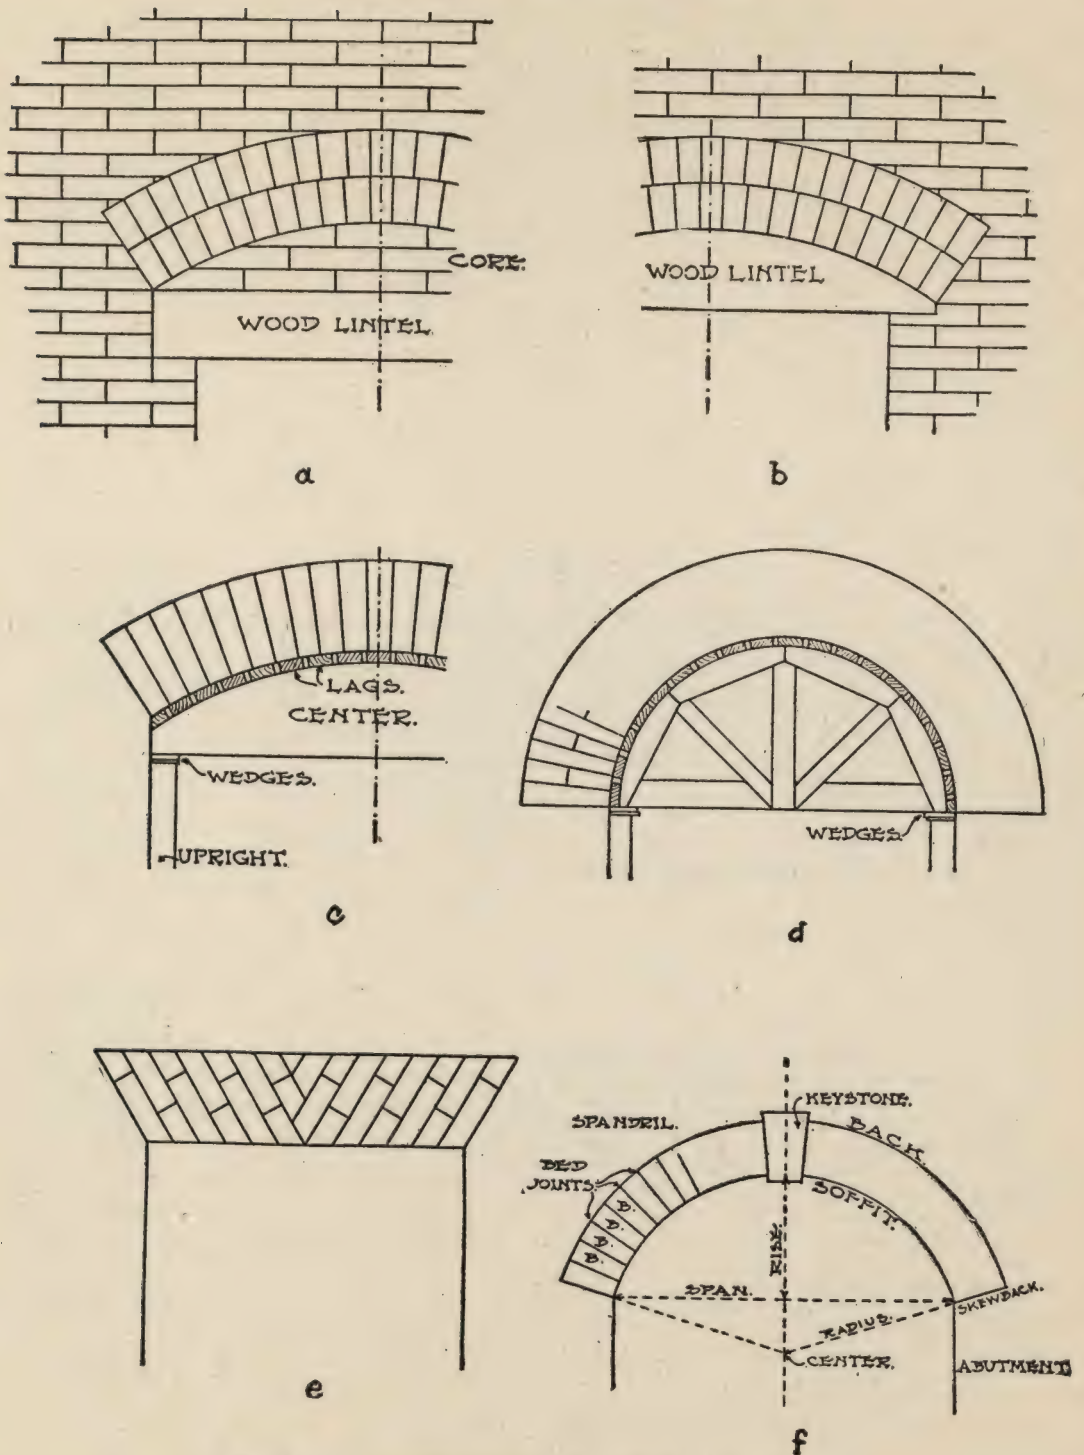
CONSTRUCTION OF BRICK ARCHES.
